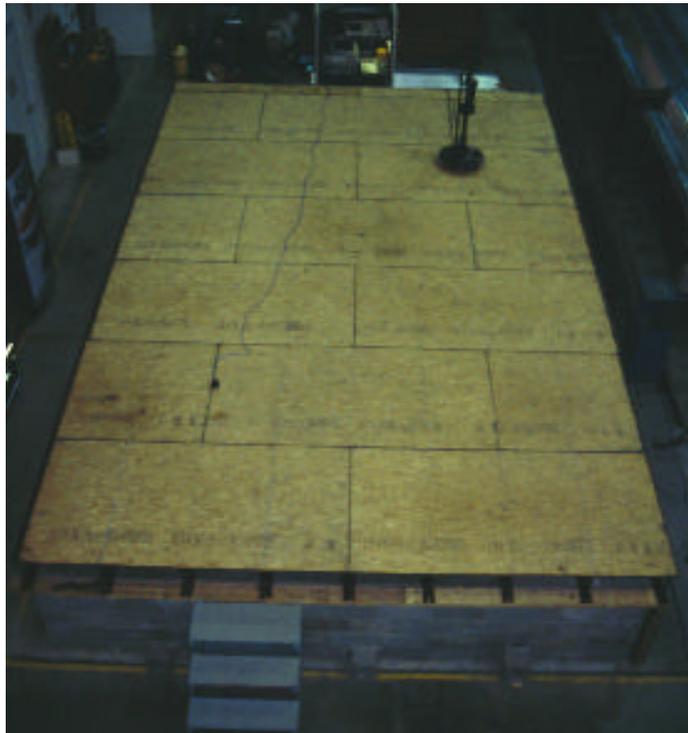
HDS and Accelerometer Located at Opposite _ Points of Floor System
